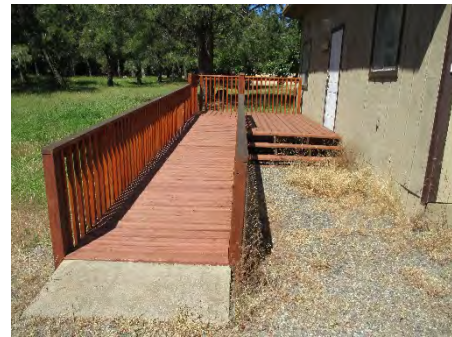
Accessible ramp of O.C. Crew Office Building. Photograph taken 6/26/2019.
